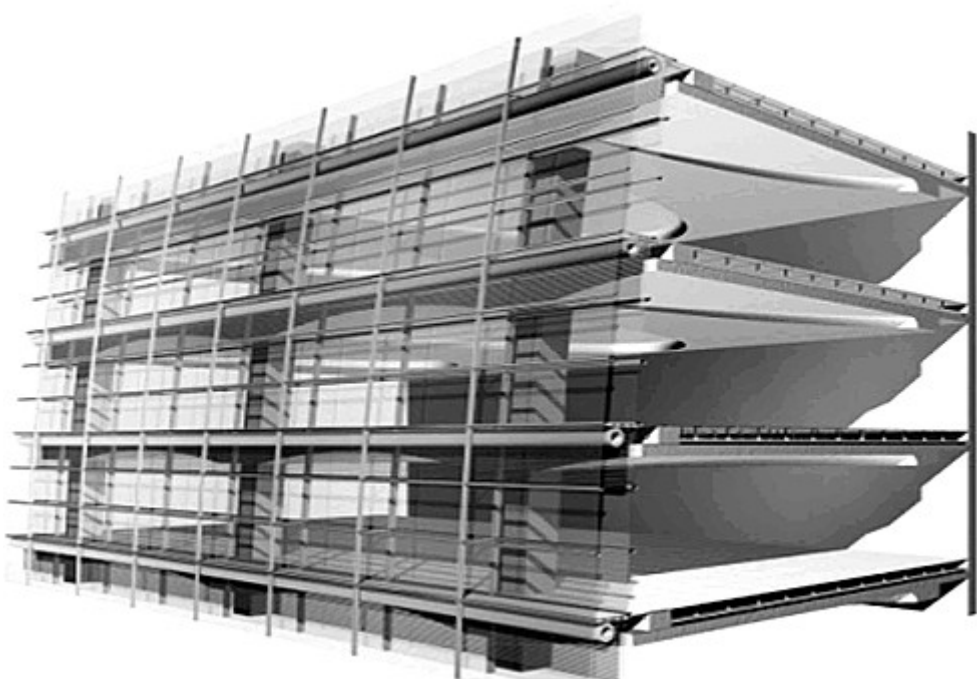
South façade: Double glazed wall system in high performance facade⁵⁶
